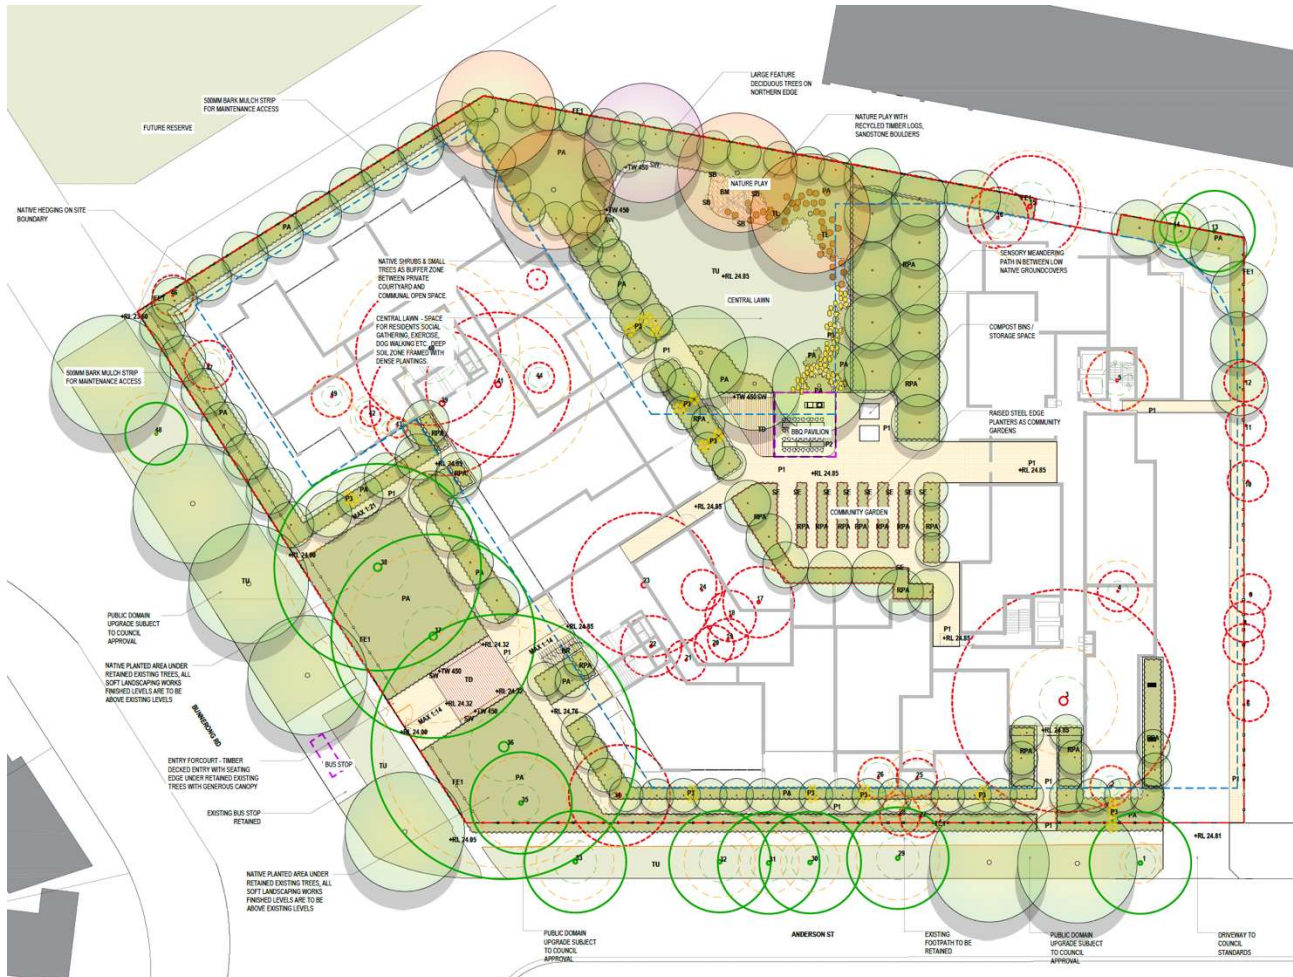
Indicative landscaping concept and tree retention (Source: Land and Form)
